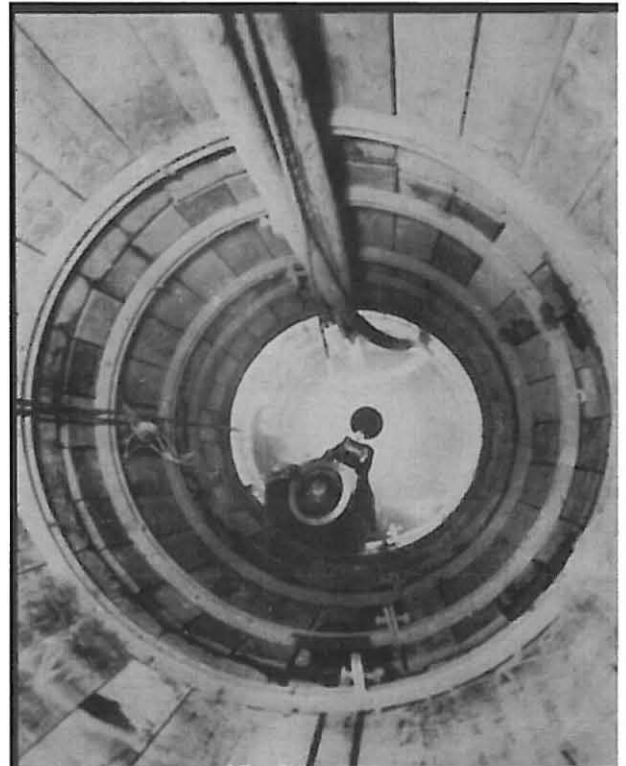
Hand dug caisson to rock showing tongue and groove lagging with rings used to support the excavation.
